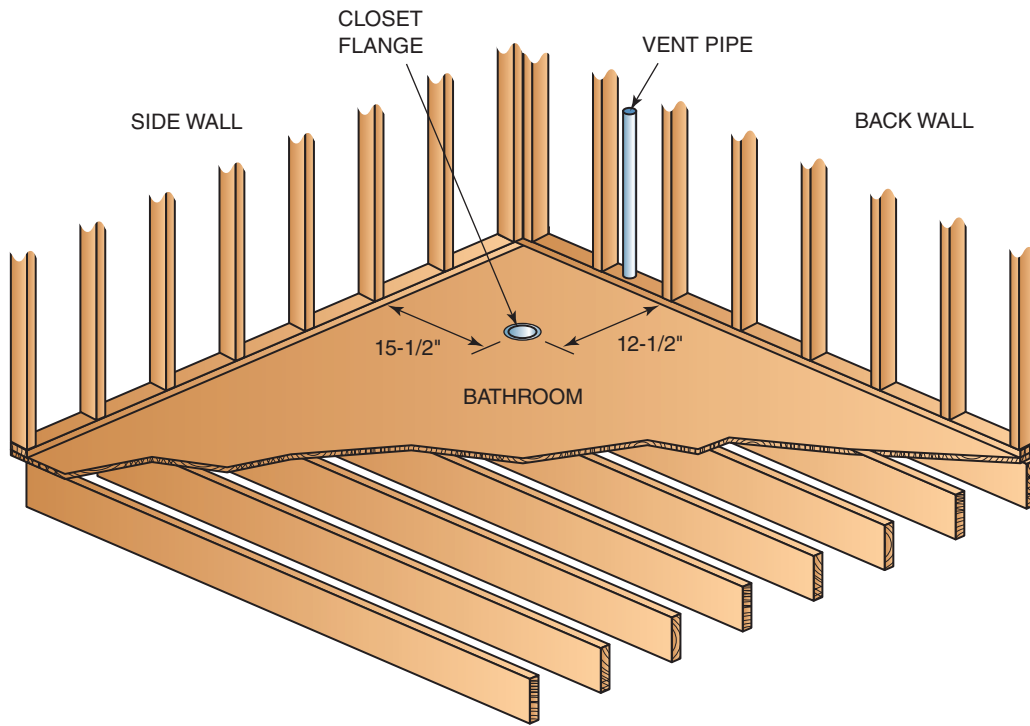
A toilet rough-in has specific code and manufacturer requirements and must be installed based on wall-finish thickness.
